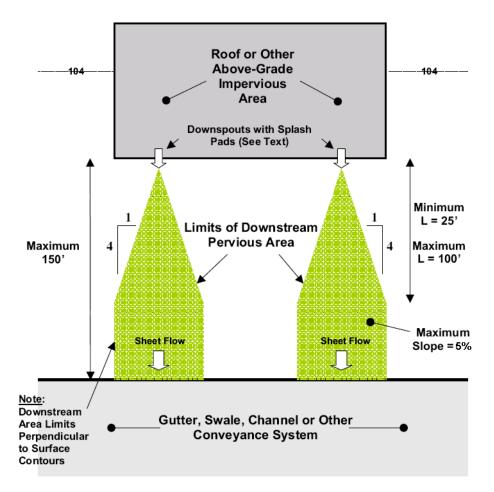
Standards for disconnecting impervious surface via downspouts. Source: New Jersey Department of Environmental Protection, 2004.
